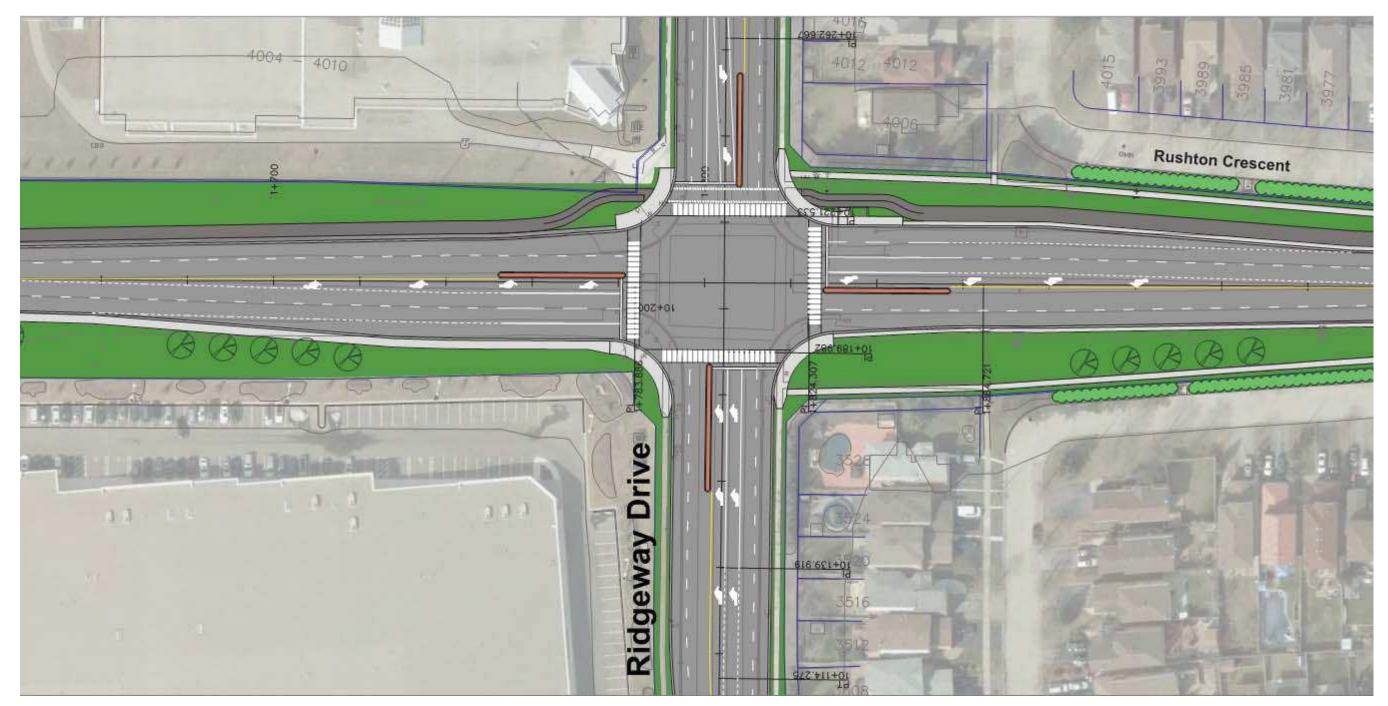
Alternative Design Concept #4 - Widen Burnhamthorpe Road West to 4 Lanes with Intersection Improvements at Ridgeway Drive
